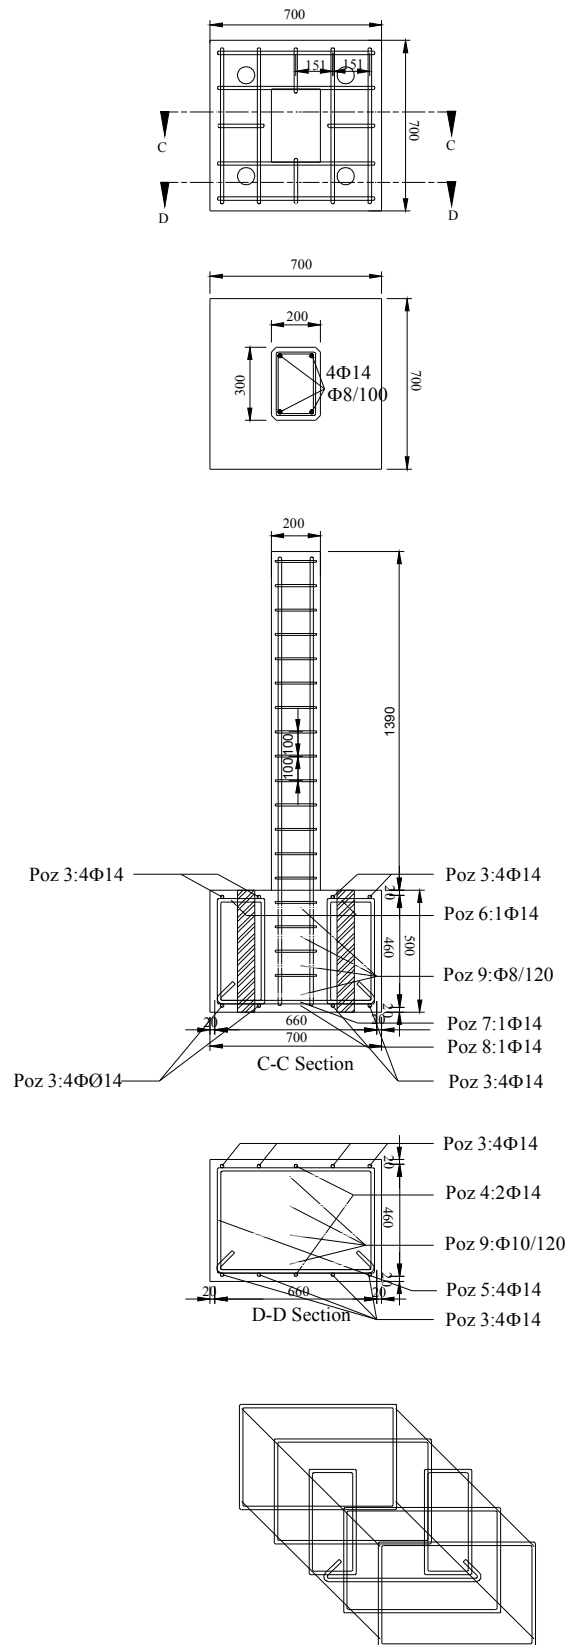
Reinforcing cage of the second type specimens (east side).
